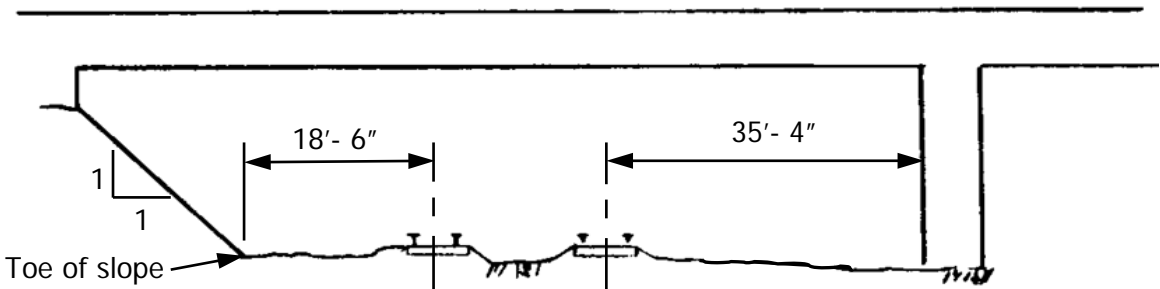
Bridge elevation view indicating horizontal offset for two railroad tracks below the bridge.
